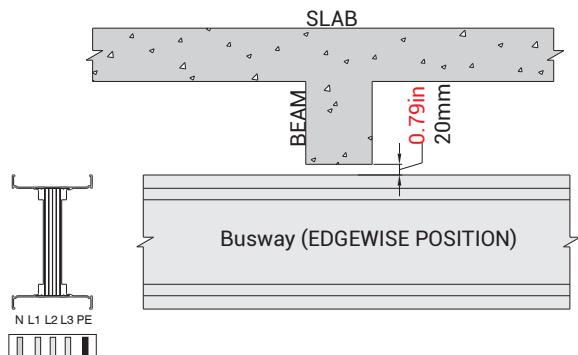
CROSSING UNDER A BEAM EDGEWISE POSITION
